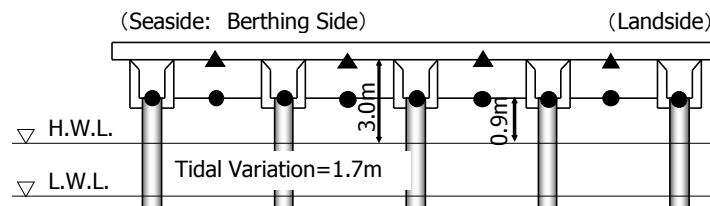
Structural Drawings of Jetty-A (OPC concrete)
